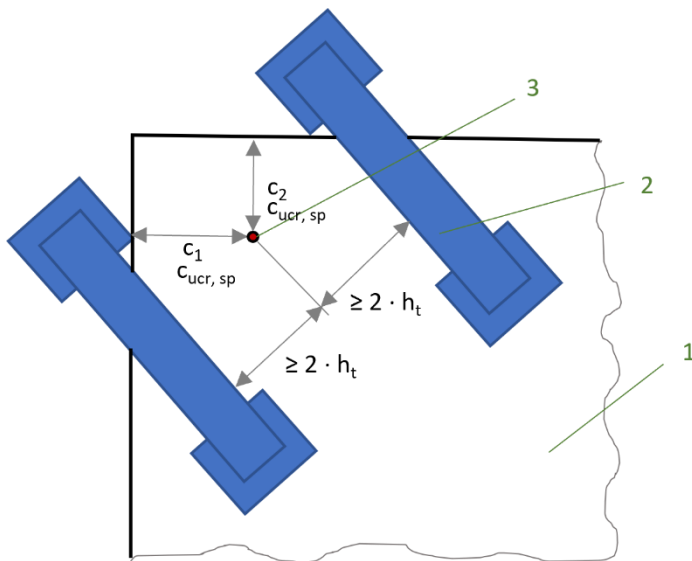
Example of the test rig for tension tests on single stainless-steel wire at a corner
